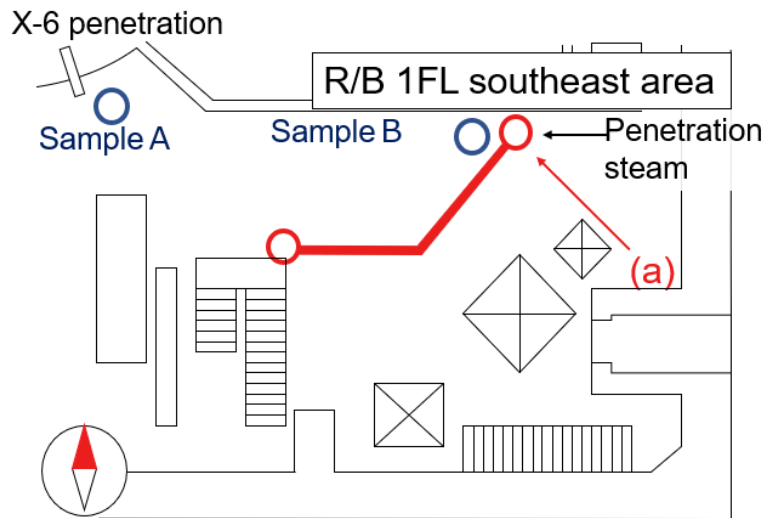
Locations of floor sample collection in the southeast area of the 1st floor
